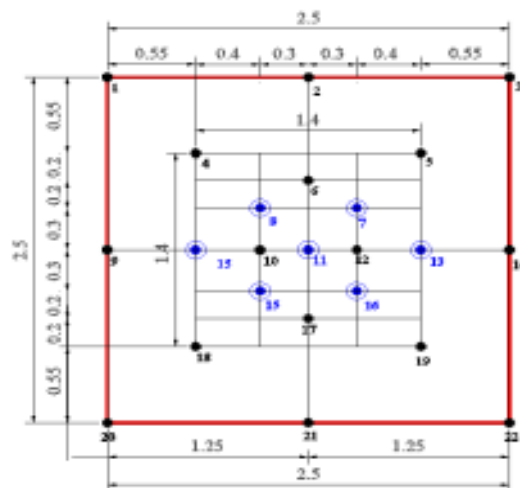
Drilling plan recommendation for rock mass with poor/fair quality (depth up to 20m).
